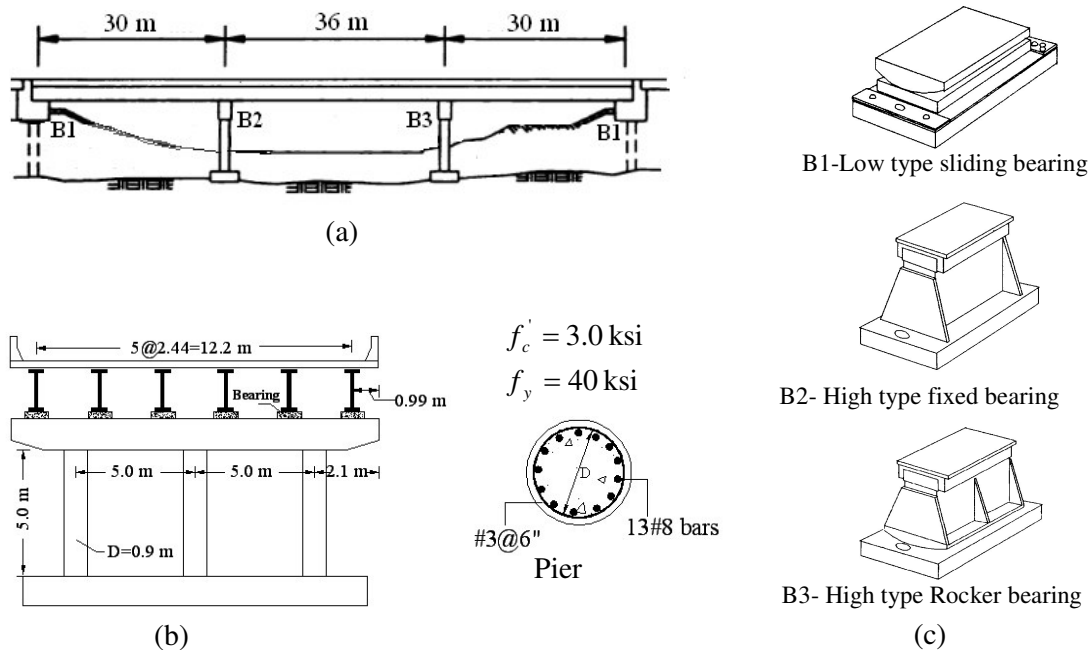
Configuration of a Typical Multi-span Continuous Steel Girder Bridge in New York State (a) Elevation; (b) Transverse cross-section; (c) Bearings.
